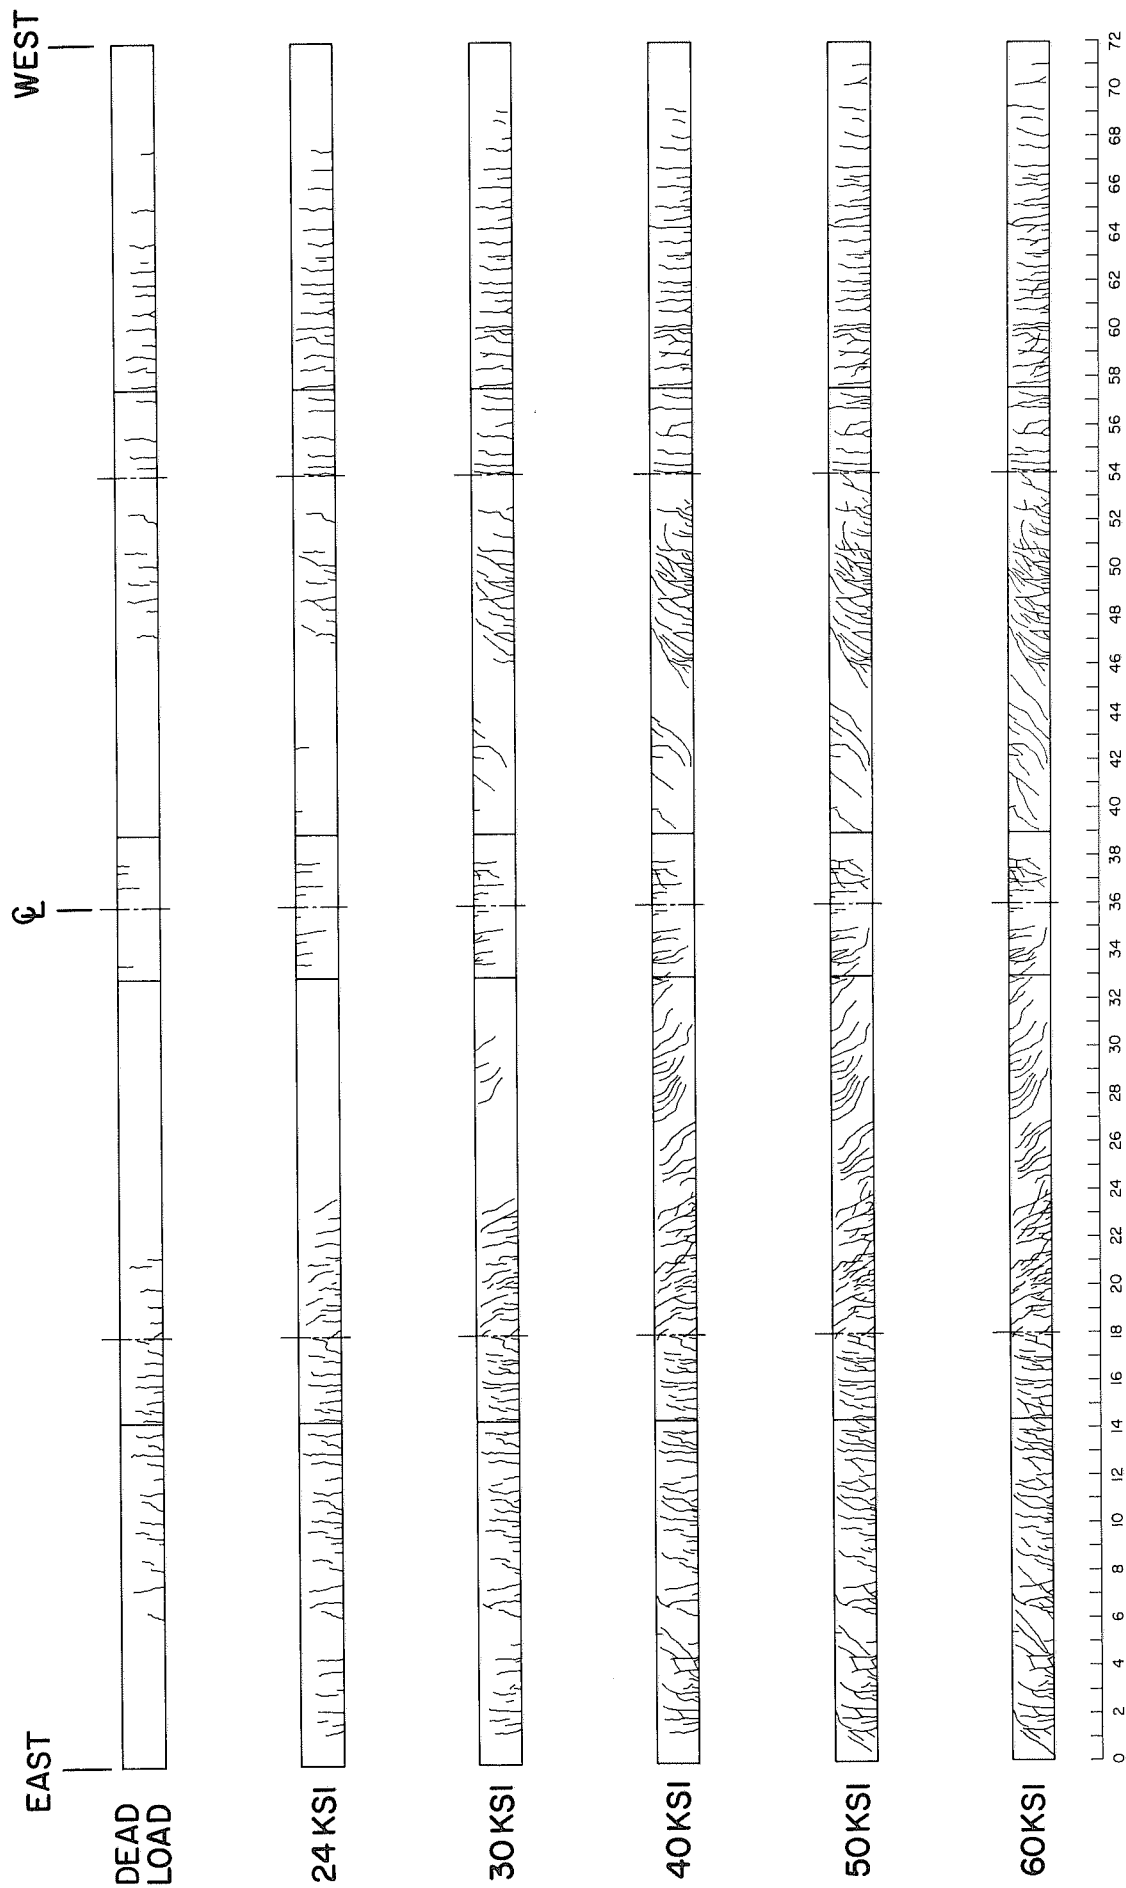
CRACK HISTORY FOR GIRDER 1 (NORTH FACE)
